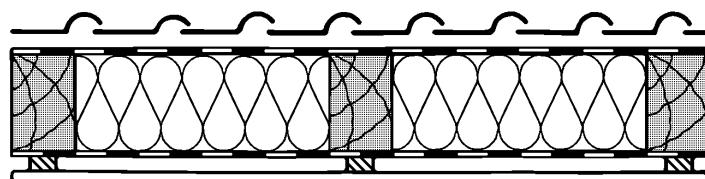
Typical construction of an unvented cathedral ceiling with glass fibre insulation between roofing membrane and vapour retarder (bottom).
